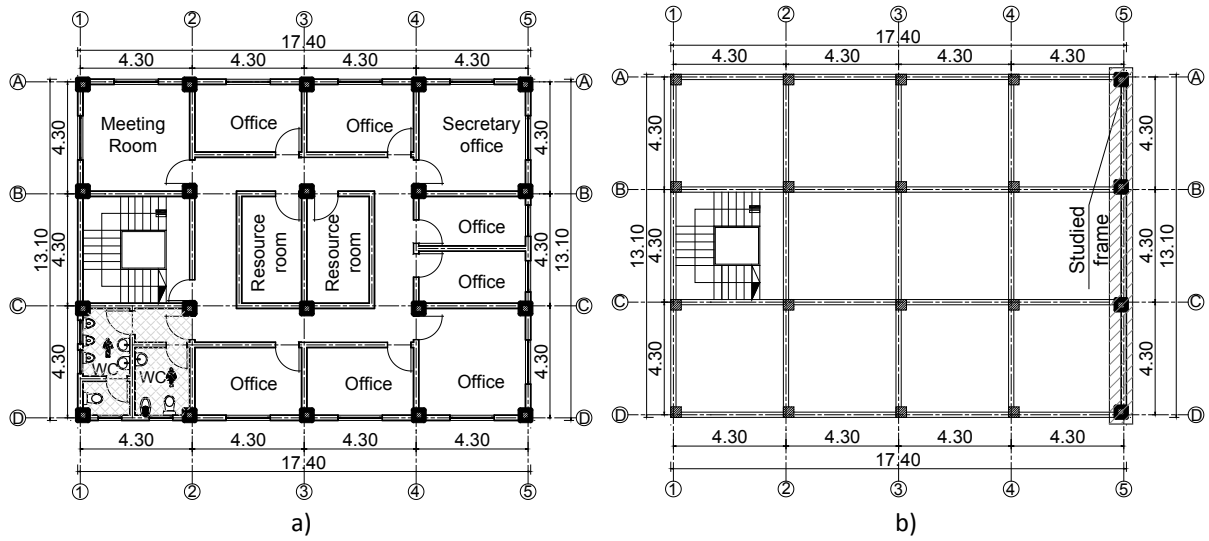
Typical plan view for the considered office building: a) architectural plan b) structural system showing the considered frame (all dimensions in m)
